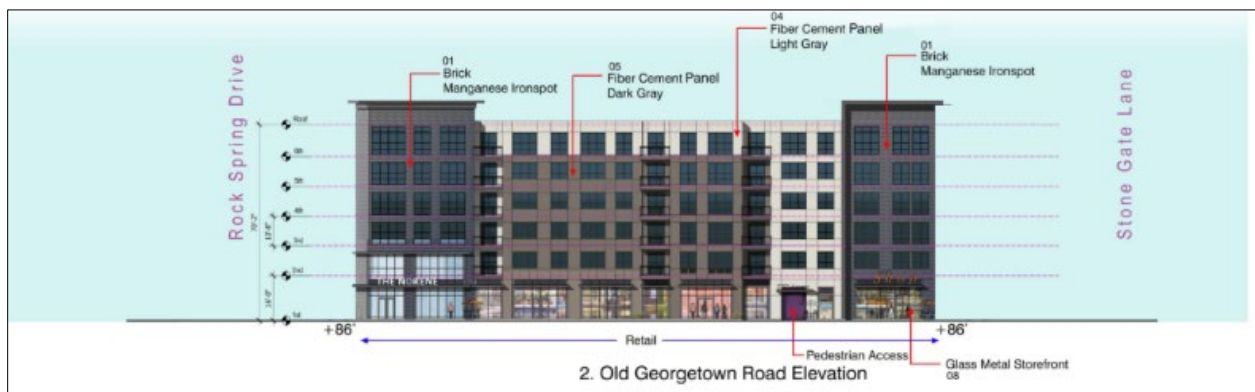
Parcel Q Building, Old Georgetown Road Elevation
